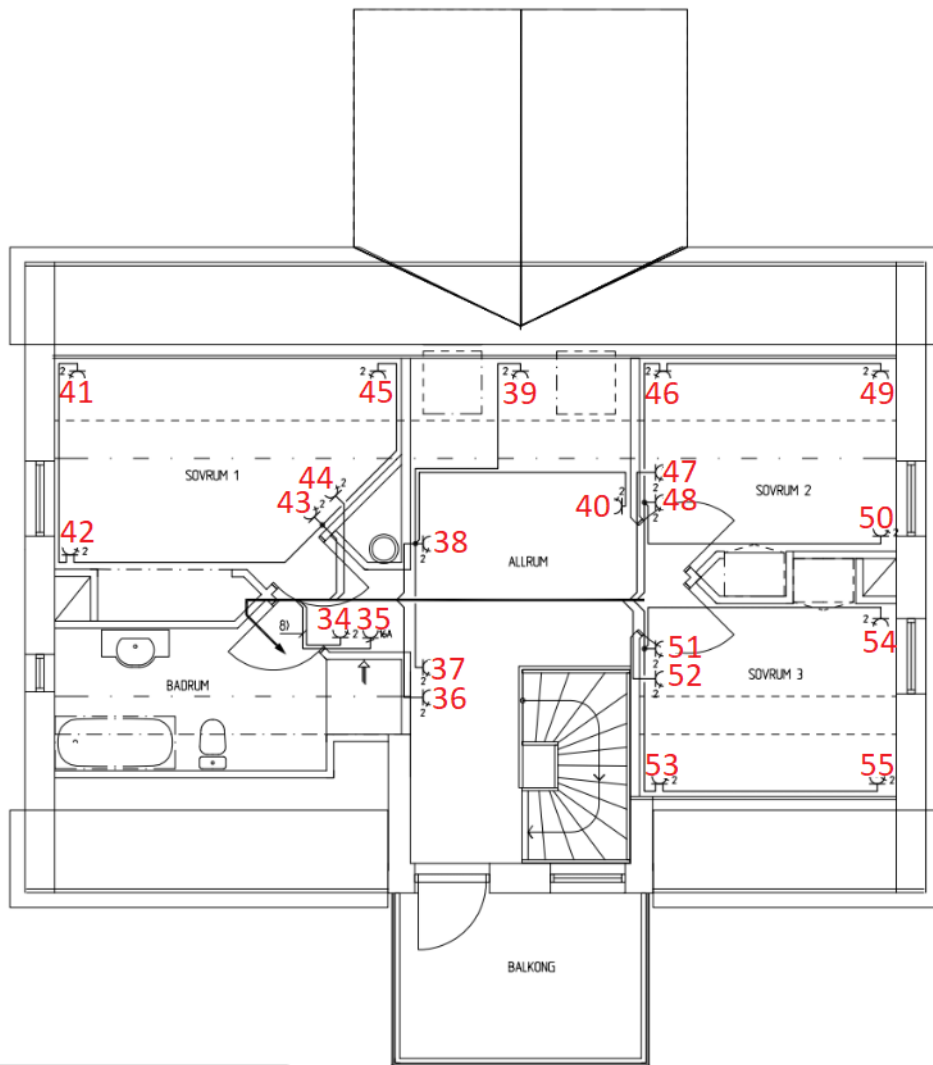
Layout of stationary and outlet connected appliances for the second floor.
